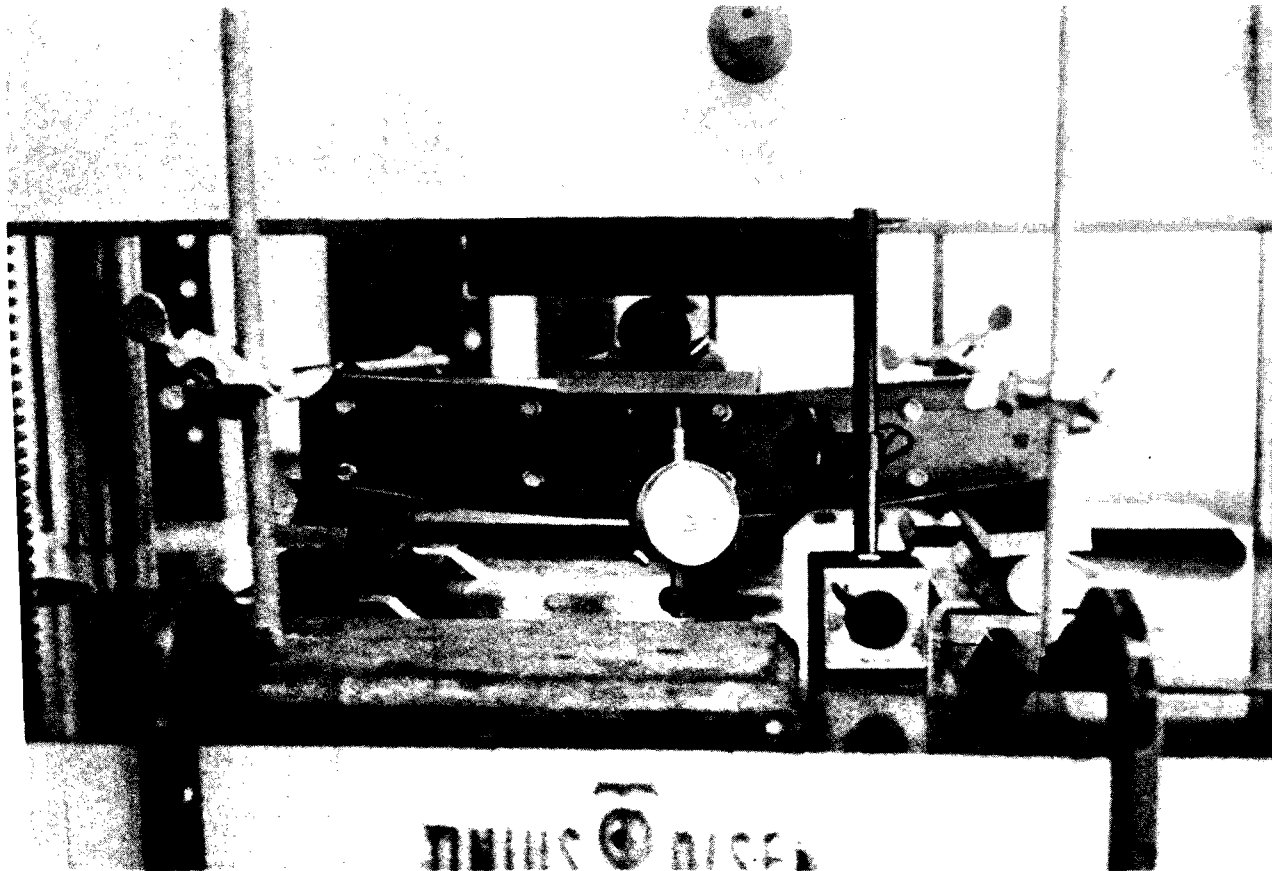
Photograph Showing Failure of an I-Beam Subjected to End One-Flange Loading
